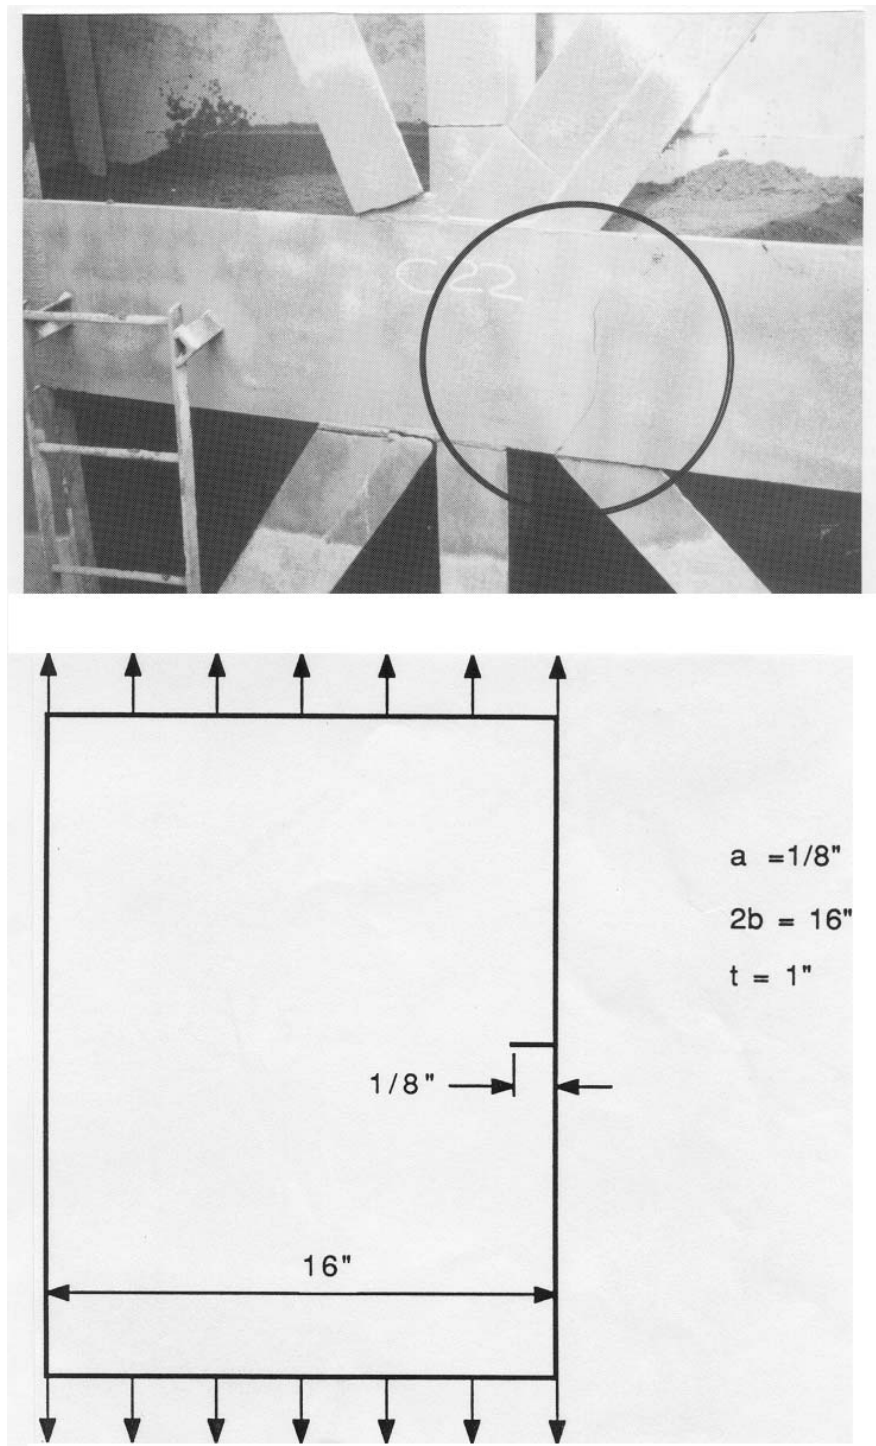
A single-edge cracked girder (1 in. = 2.54 cm)
